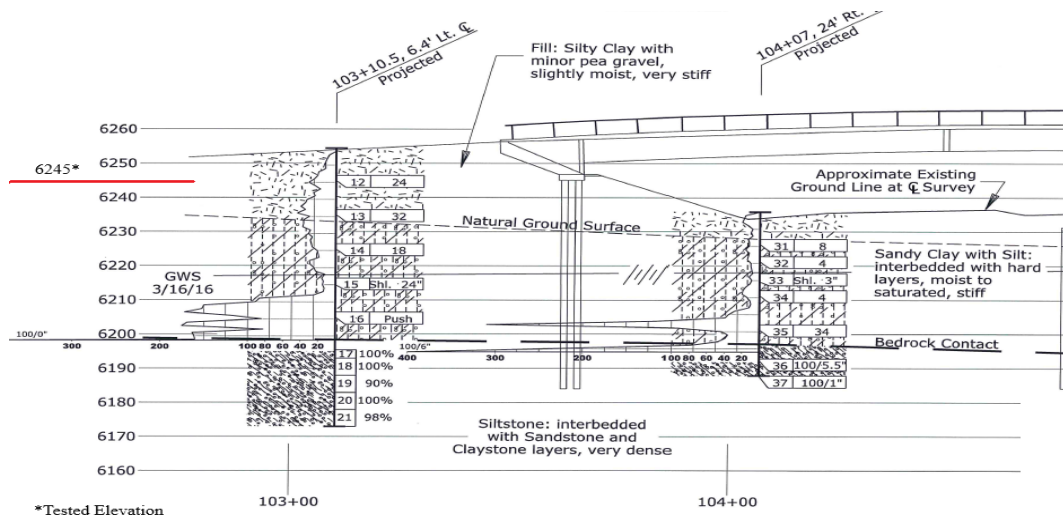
Subsurface cross section for Interchange Road Bridge replacement project (Scott, 2017), red line indicates elevation of the seismic survey.
